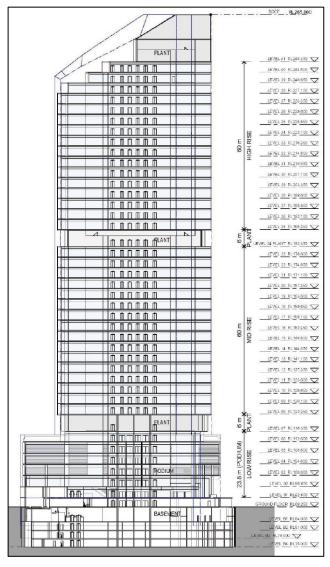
Indicative concept scheme elevation (source: Urbis planning proposal)
